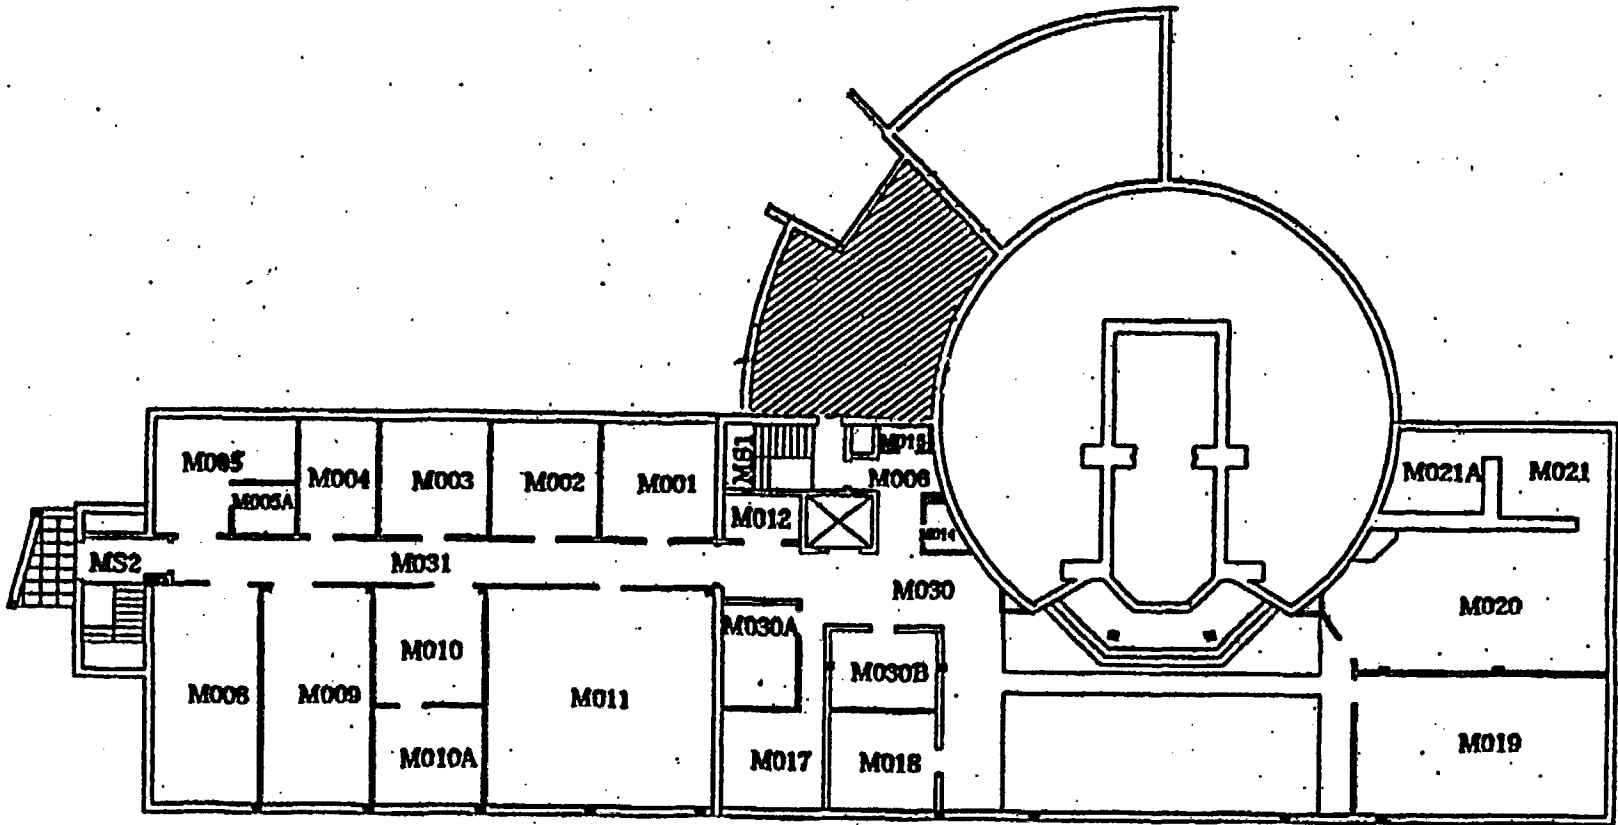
UVA Mezzanine Floor Plan View Indicating the Location of the Mezzanine Crawl Space.
